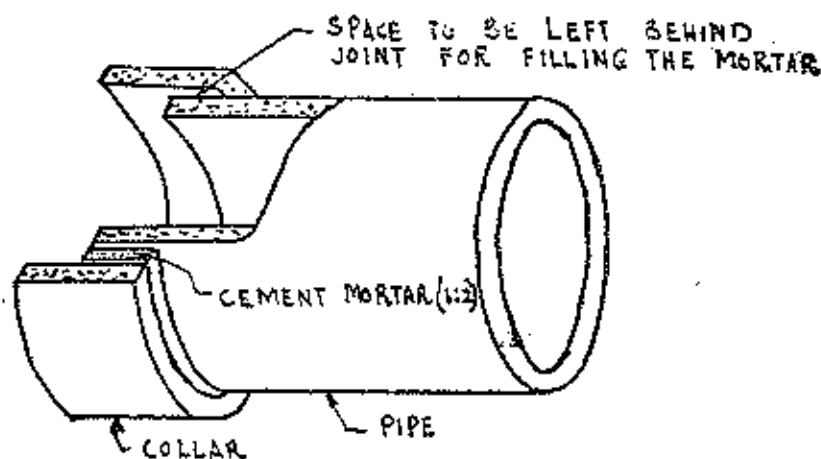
(a) FIG. REINFORCED CONCRETE COLLAR JOINT.
